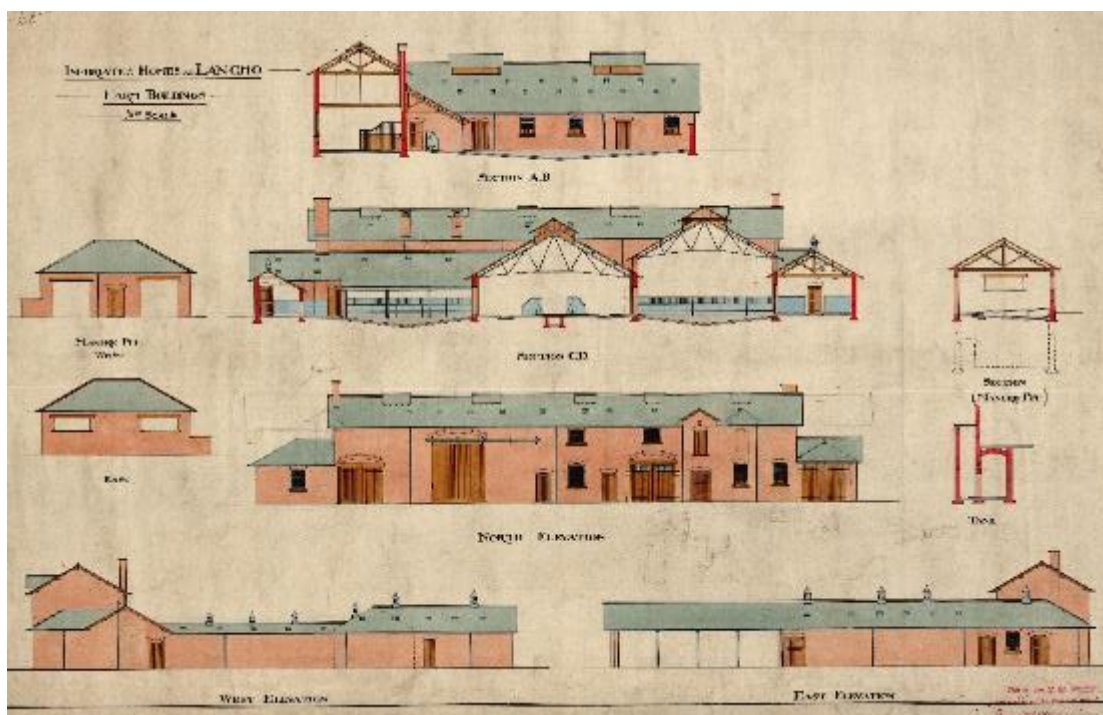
Elevations and sections of Brockhall Farm buildings held by Mr Willan
